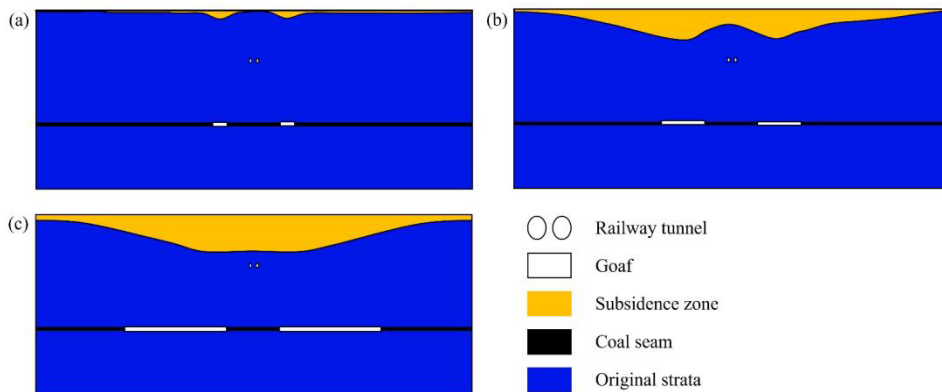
Schematic evolution of the surface subsidence basin: (a) Excavation at 50 m; (b) Excavation at 150 m; (c) Excavation at 350 m.
